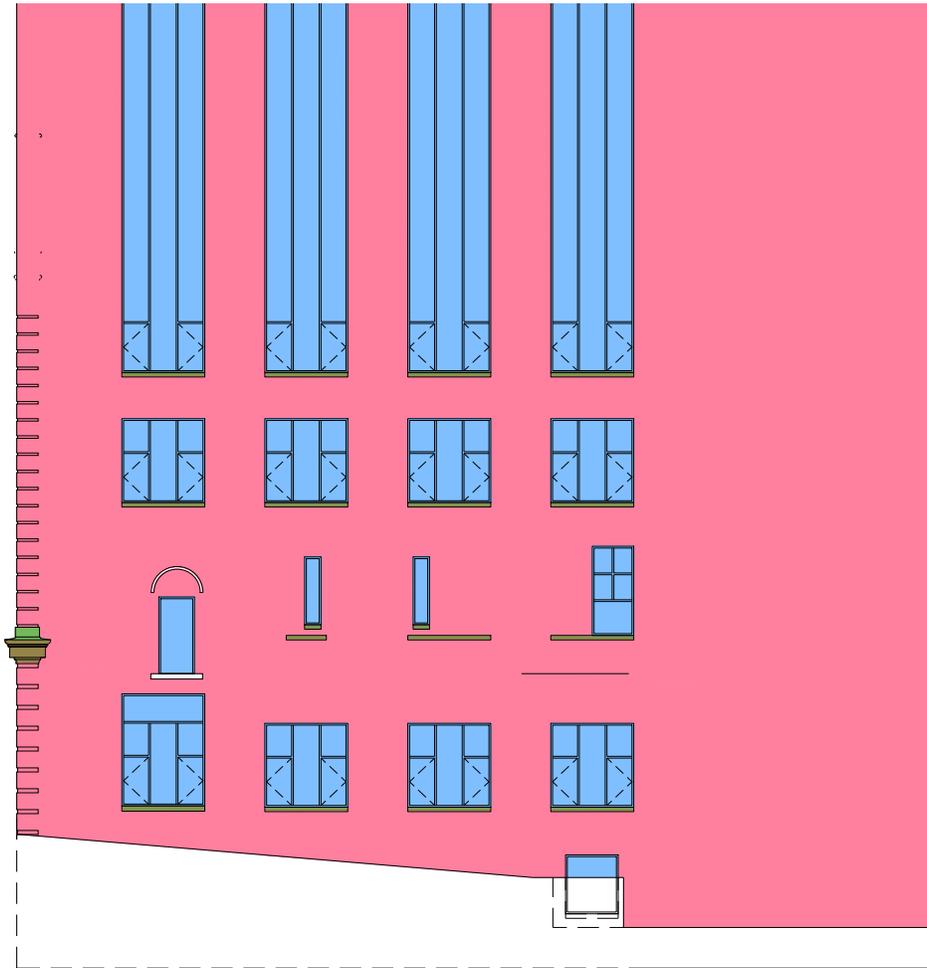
(4): North Courtyard: West-Facing Wall
